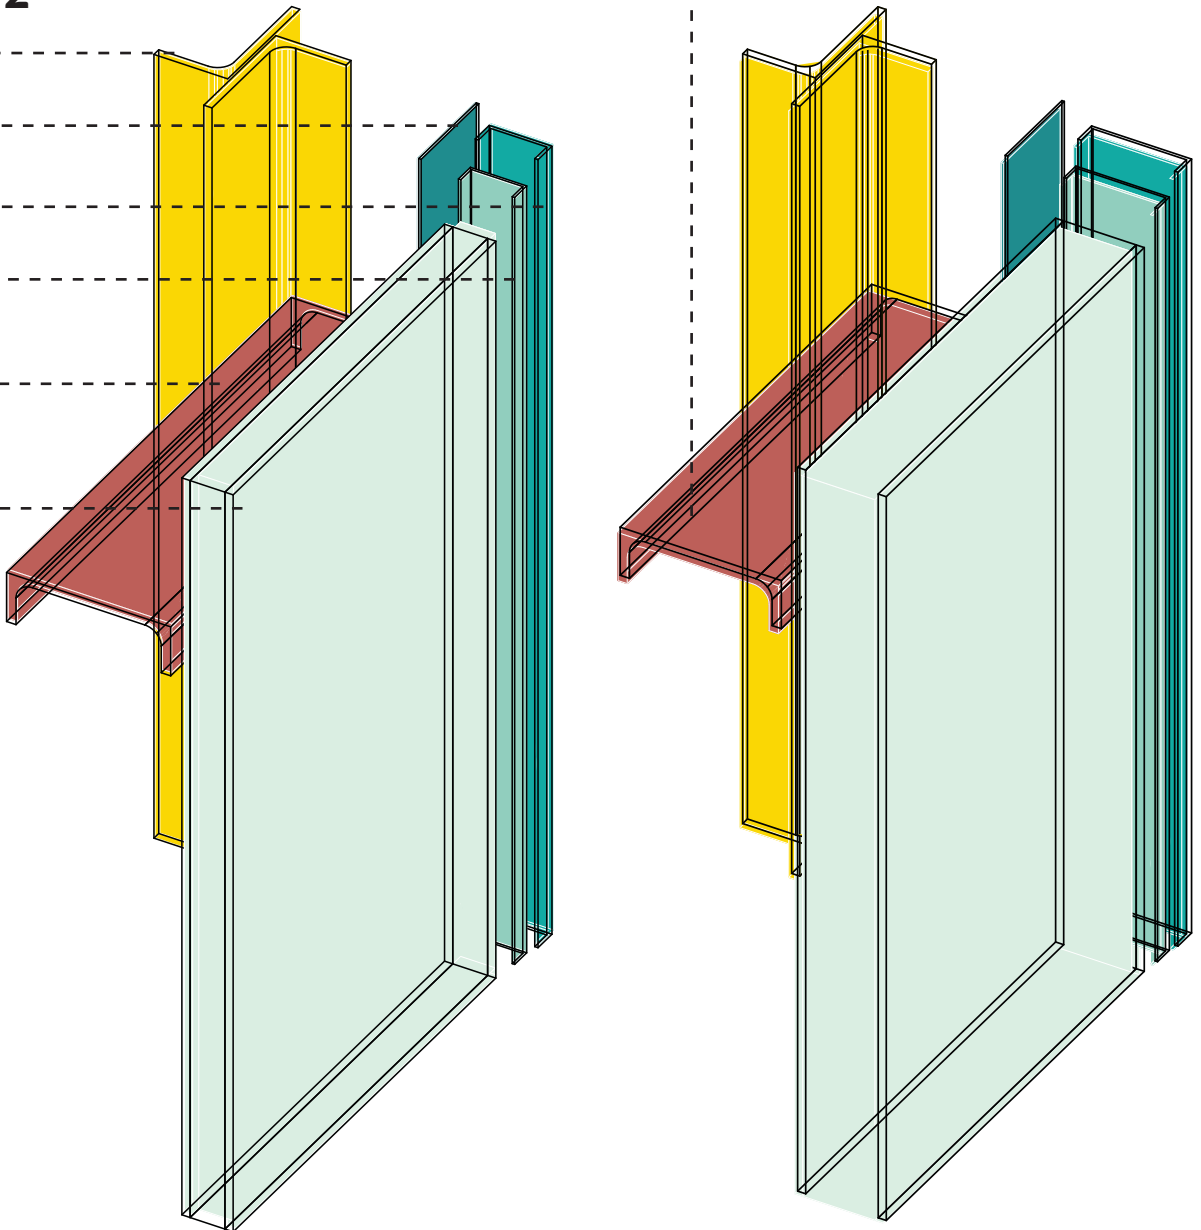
Illustration of potential connections between panel construction and structural column (author,2017)
